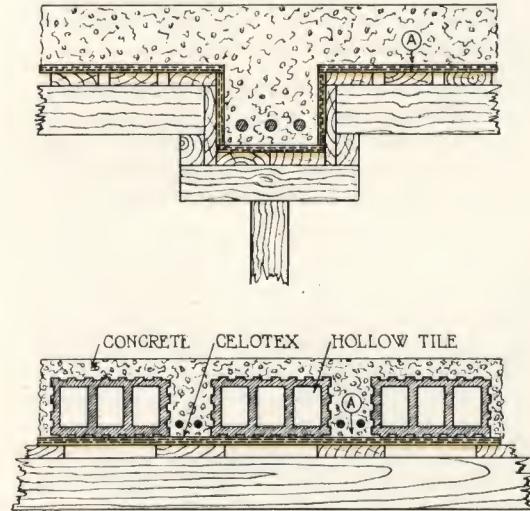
CELOTEX ON SHUTTERING FOR HOLLOW TILE CEILING, BONDED TO CONCRETE
